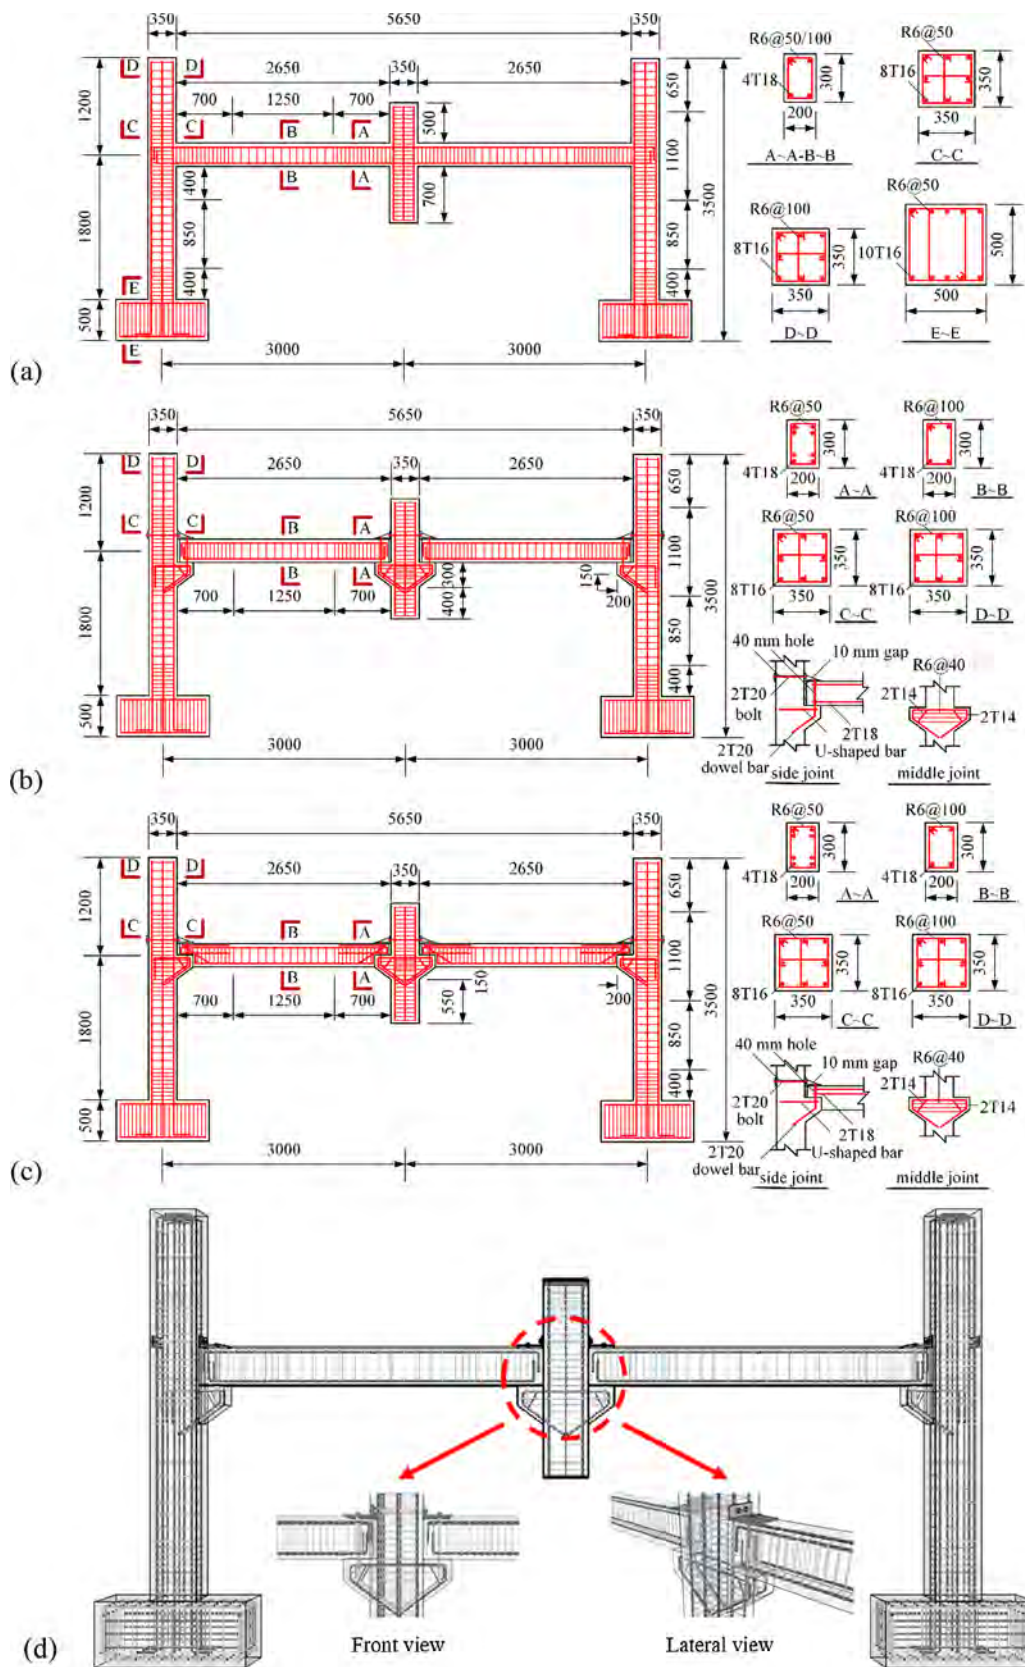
Dimensions and cross sectional details of test specimens: (a) specimen RC; (b) specimen PC1; (c) specimen PC2; (d) three-dimensional sketch of PC specimens.
